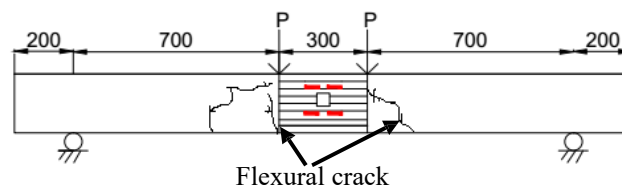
Crack pattern of beam B4 (unit in mm).
